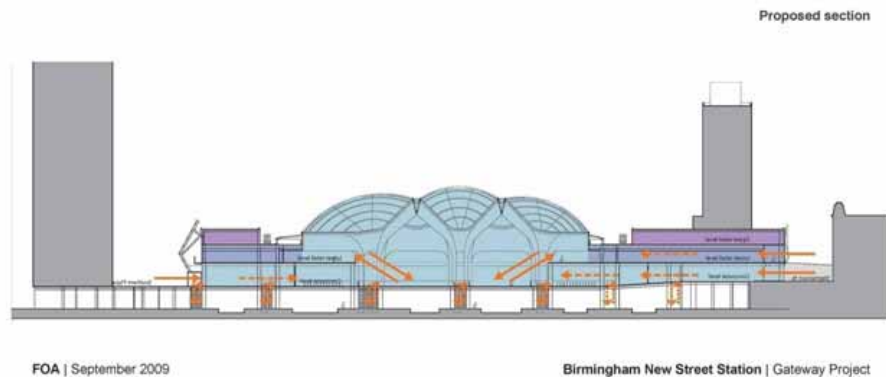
Proposed section through Birmingham New Street indicating topography and access
